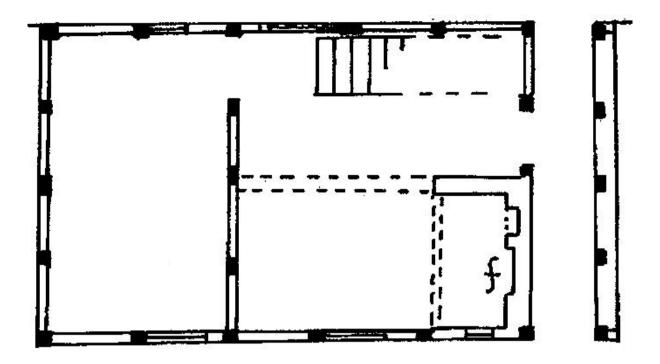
Ground floor plan of 56 Potter Street (after Barbara Hutton and Howard Usher)
